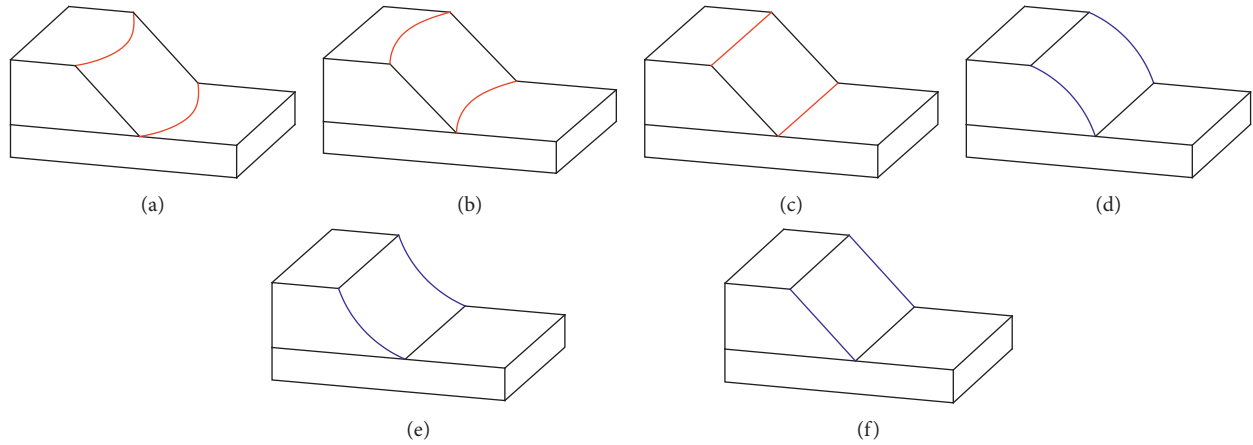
Different slope shapes. (a) Convex plan. (b) Concave plan. (c) Linear plan. (d) Convex profile. (e) Concave profile. (f) Linear profile.
